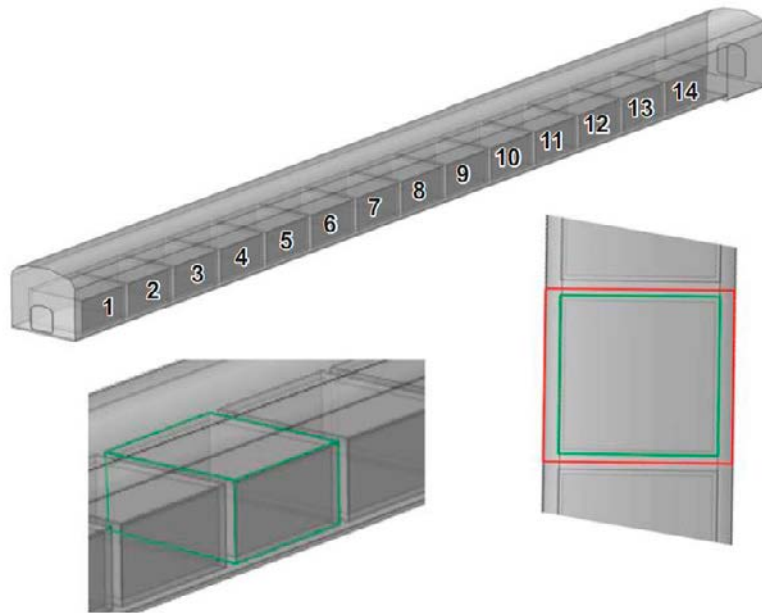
The division of 2BMA into control volumes in the hydrological model (Abarca et al. 2013). The green wire frame marks one of the caissons. The red wire frame in the plan view delimits one caisson and surrounding backfill as one of the 14 sections modelled in the RNT model.
